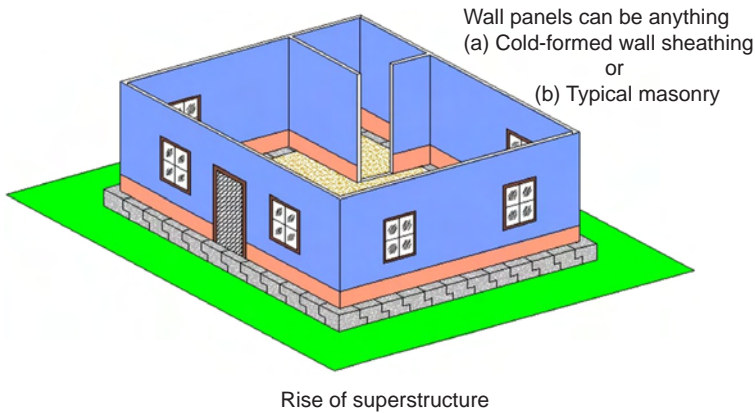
Erection of wall panels fabricated using LGSF (non-loading member)
